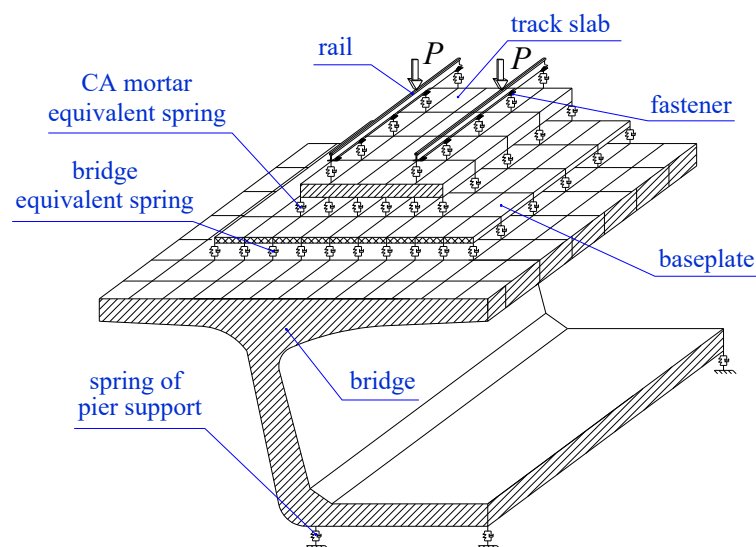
Elastic beam–plate of ballastless track slab on a bridge.
